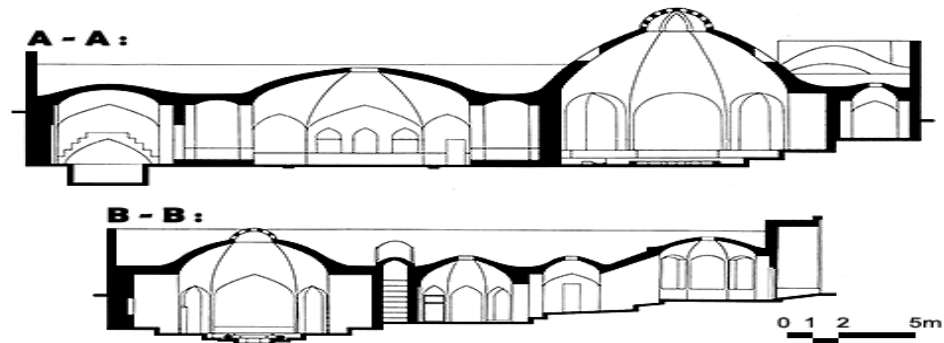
Section of a public bath (Source: (Ghoolabad 2010))
